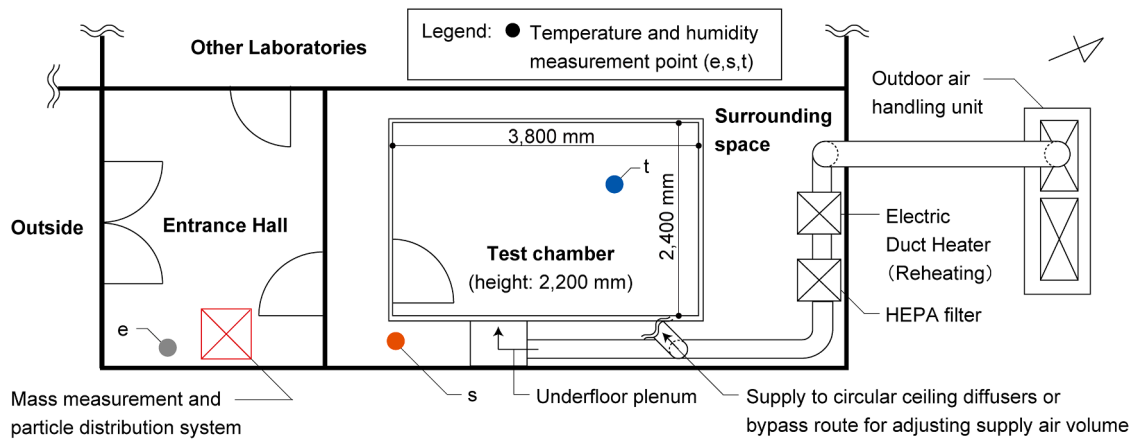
Schematic layout of the test chamber and surrounding environment.
